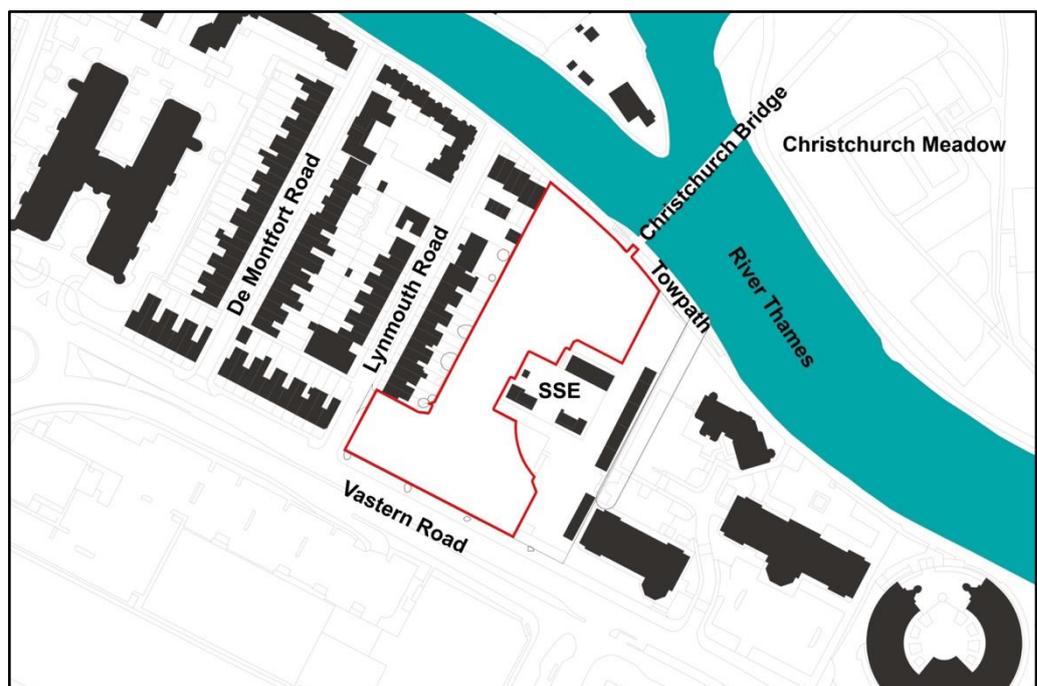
Site Location Plan, orientation with north to the top of the plan
